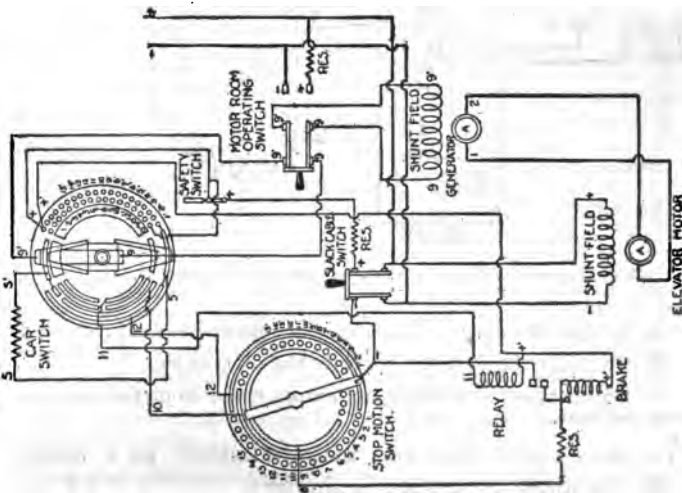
,254.—Diagram of Otis mechanical reversing control with type B reversing switch.
